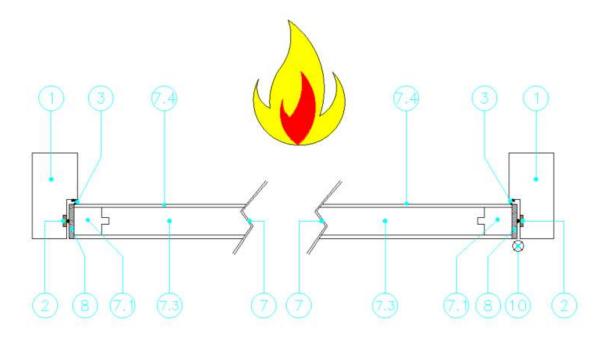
Details of Door Frame, Jamb and Leaf Doorset A
